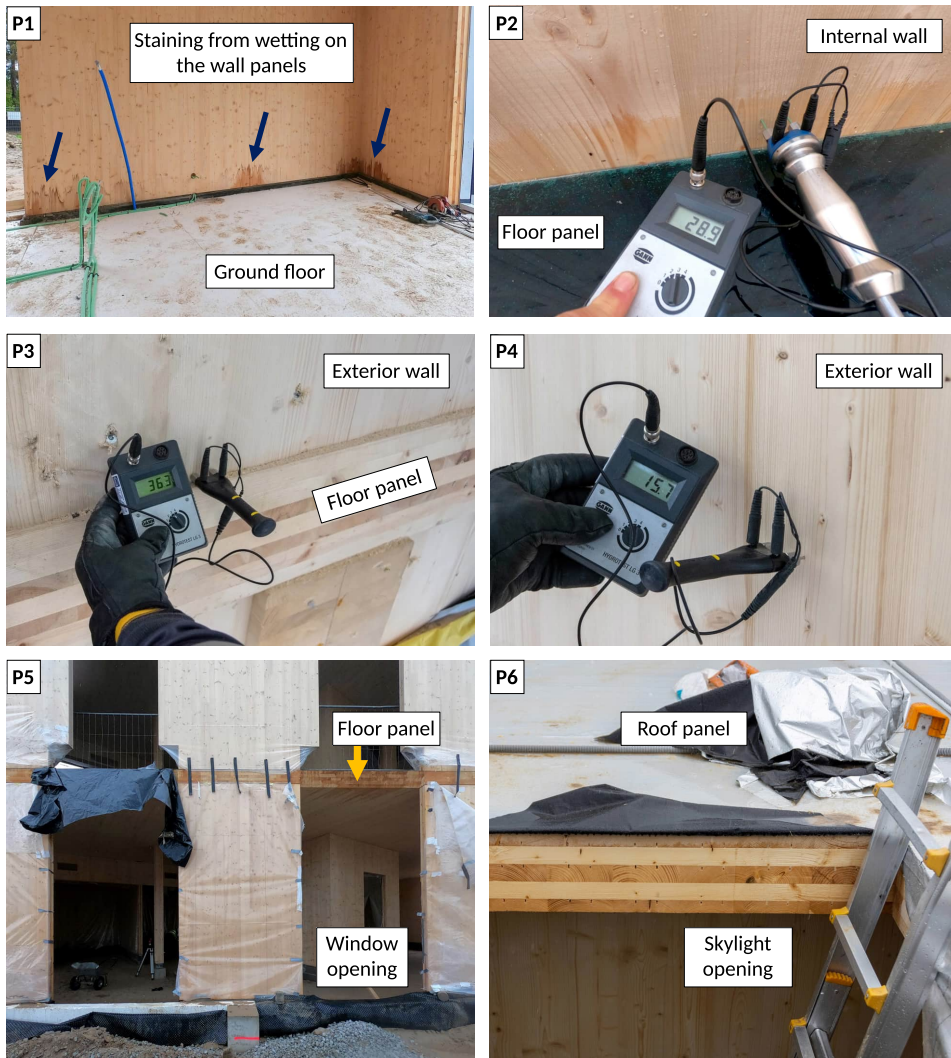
Photos of areas vulnerable to wetting in CLT construction. P1 depicts the wall-to-foundation connection, while P2 & P4 show the wall-to-floor panel connection. P4 illustrates that the same wall panel as in P3 remained dry further away from the floor panel connection. P5 shows window openings, and P6 shows a skylight opening.
